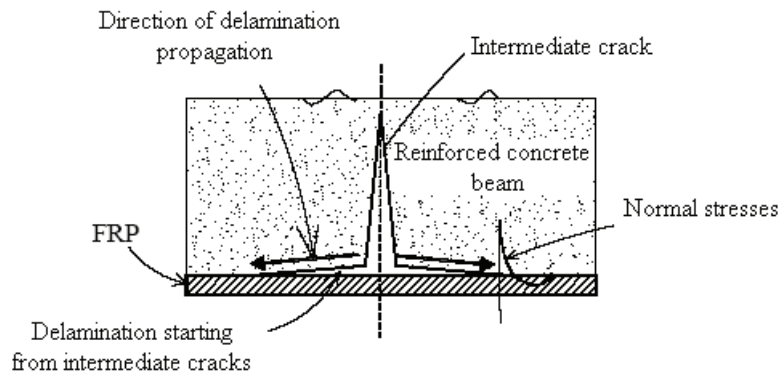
Debonding starting from vertical cracks in concrete.
